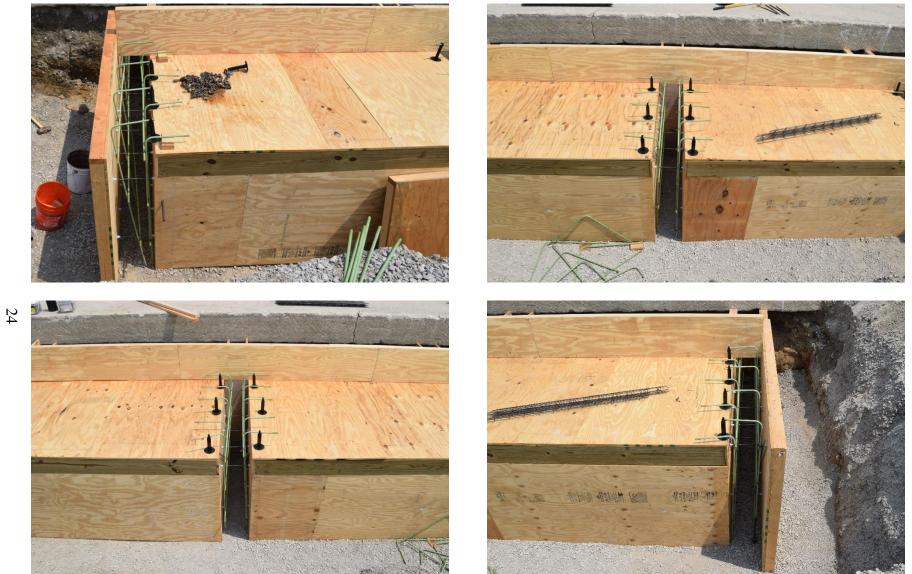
Concrete Culvert Support Walls Framework, Test Nos. CMGS-1 and CMGS-2
